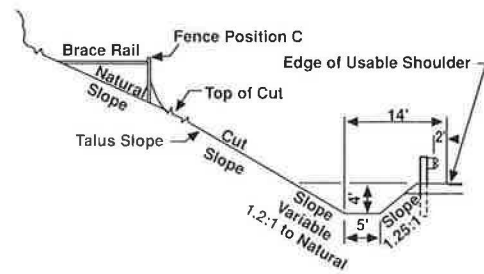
Roadway section on talus slope—Design B, fence position C.
